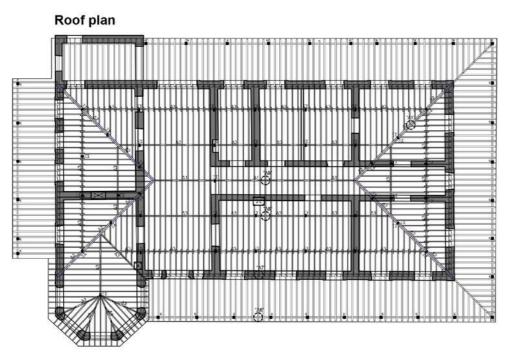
Construction phase pictures and details - Roof. © C. Marathovouniotis
